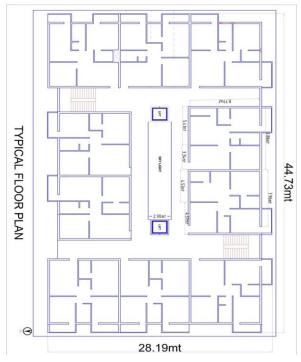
Typical Floor Plan (Option1: RCC Structure, Option2: PEB Structure)
